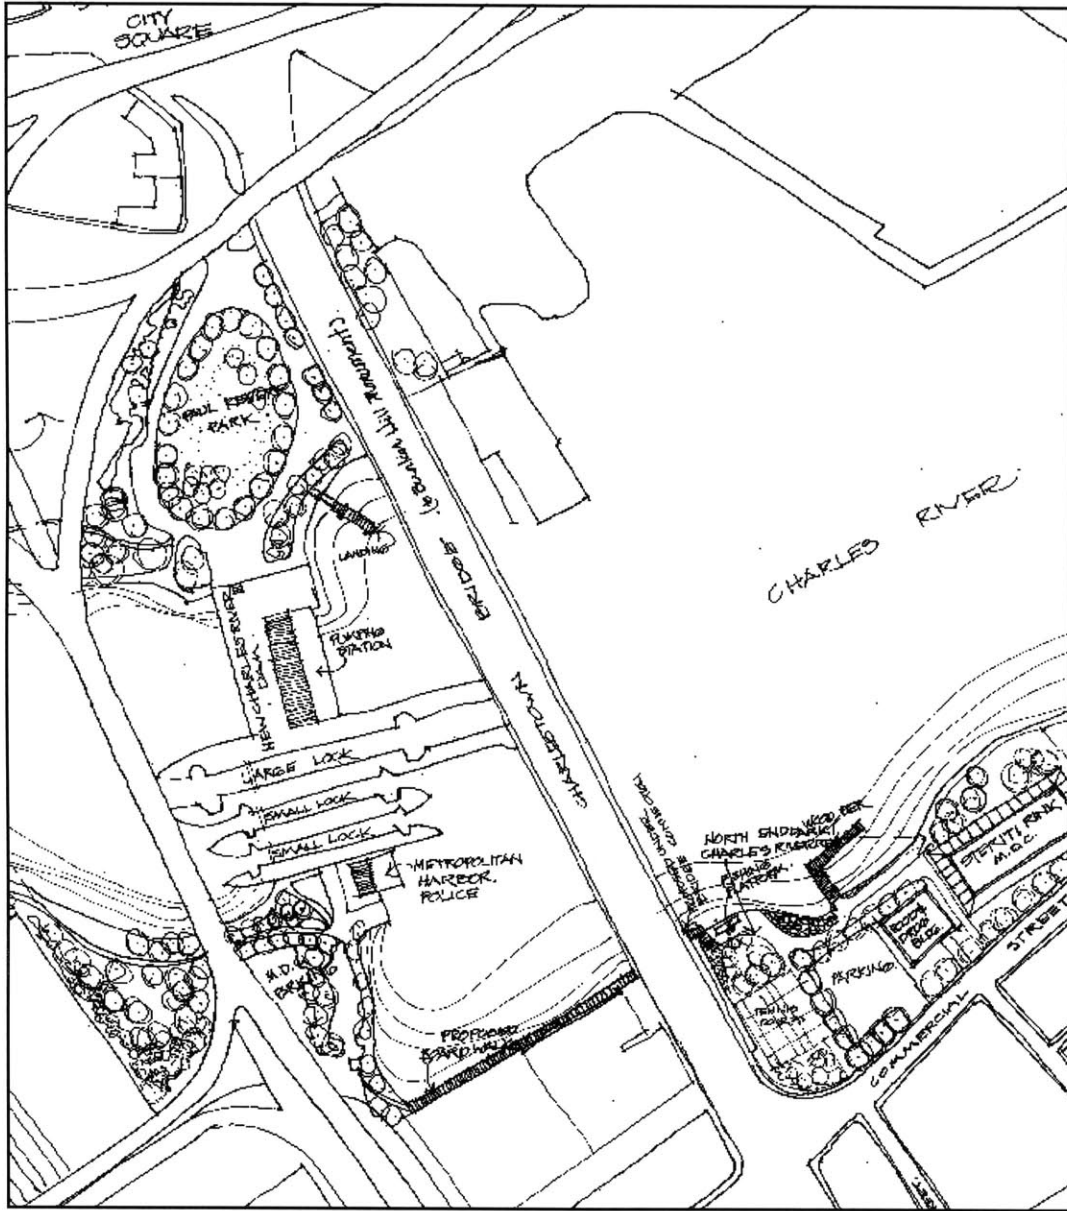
New Charles River Basin Master Plan, detail at the new dam, 1980.
